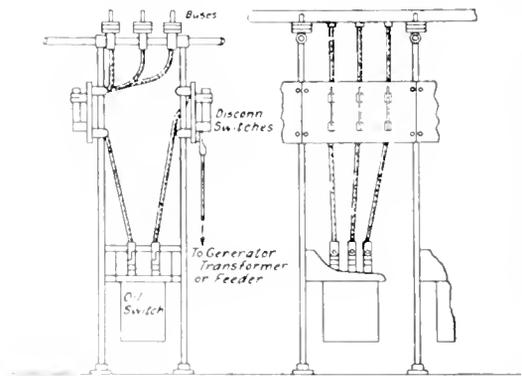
Arrangement of Oil-Switches with double set of Disconnecting Switches on Frame-work
